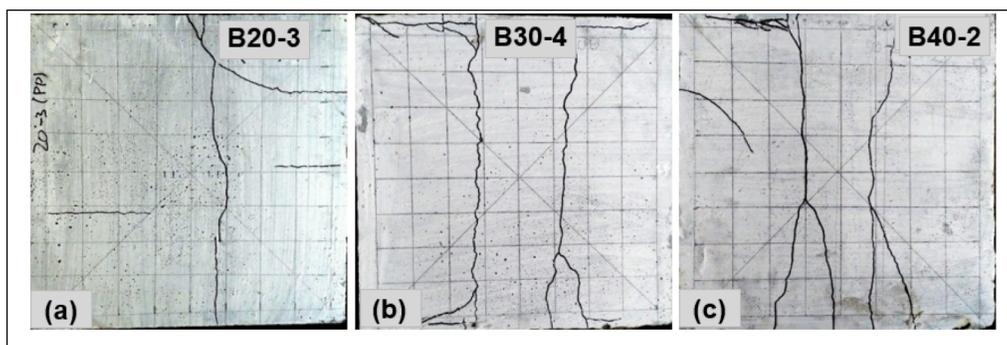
Cracks at bottom face in bending test; (a) Flexure cracks, (b) Flexure cracks with minor shear cracks, (c) Flexure and shear crack
